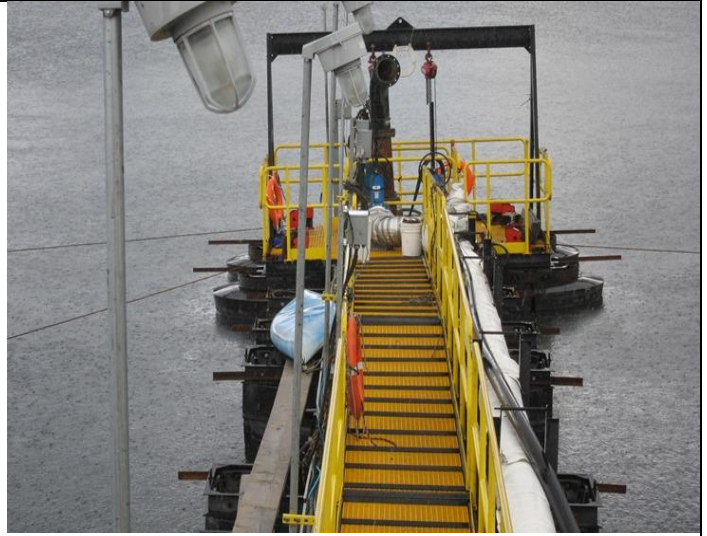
Closer view of barge pump system...showing the 3-anchor cables.
